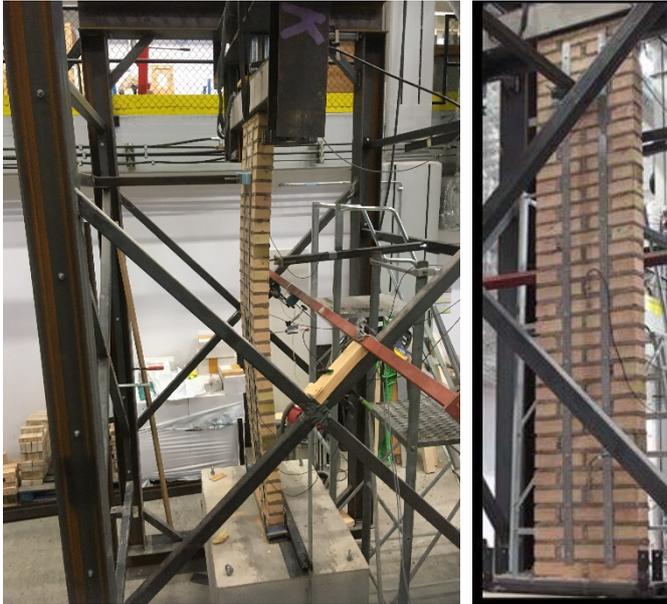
W3_1 Testing of brick wall strengthened with mechanically fastened steel strips.
